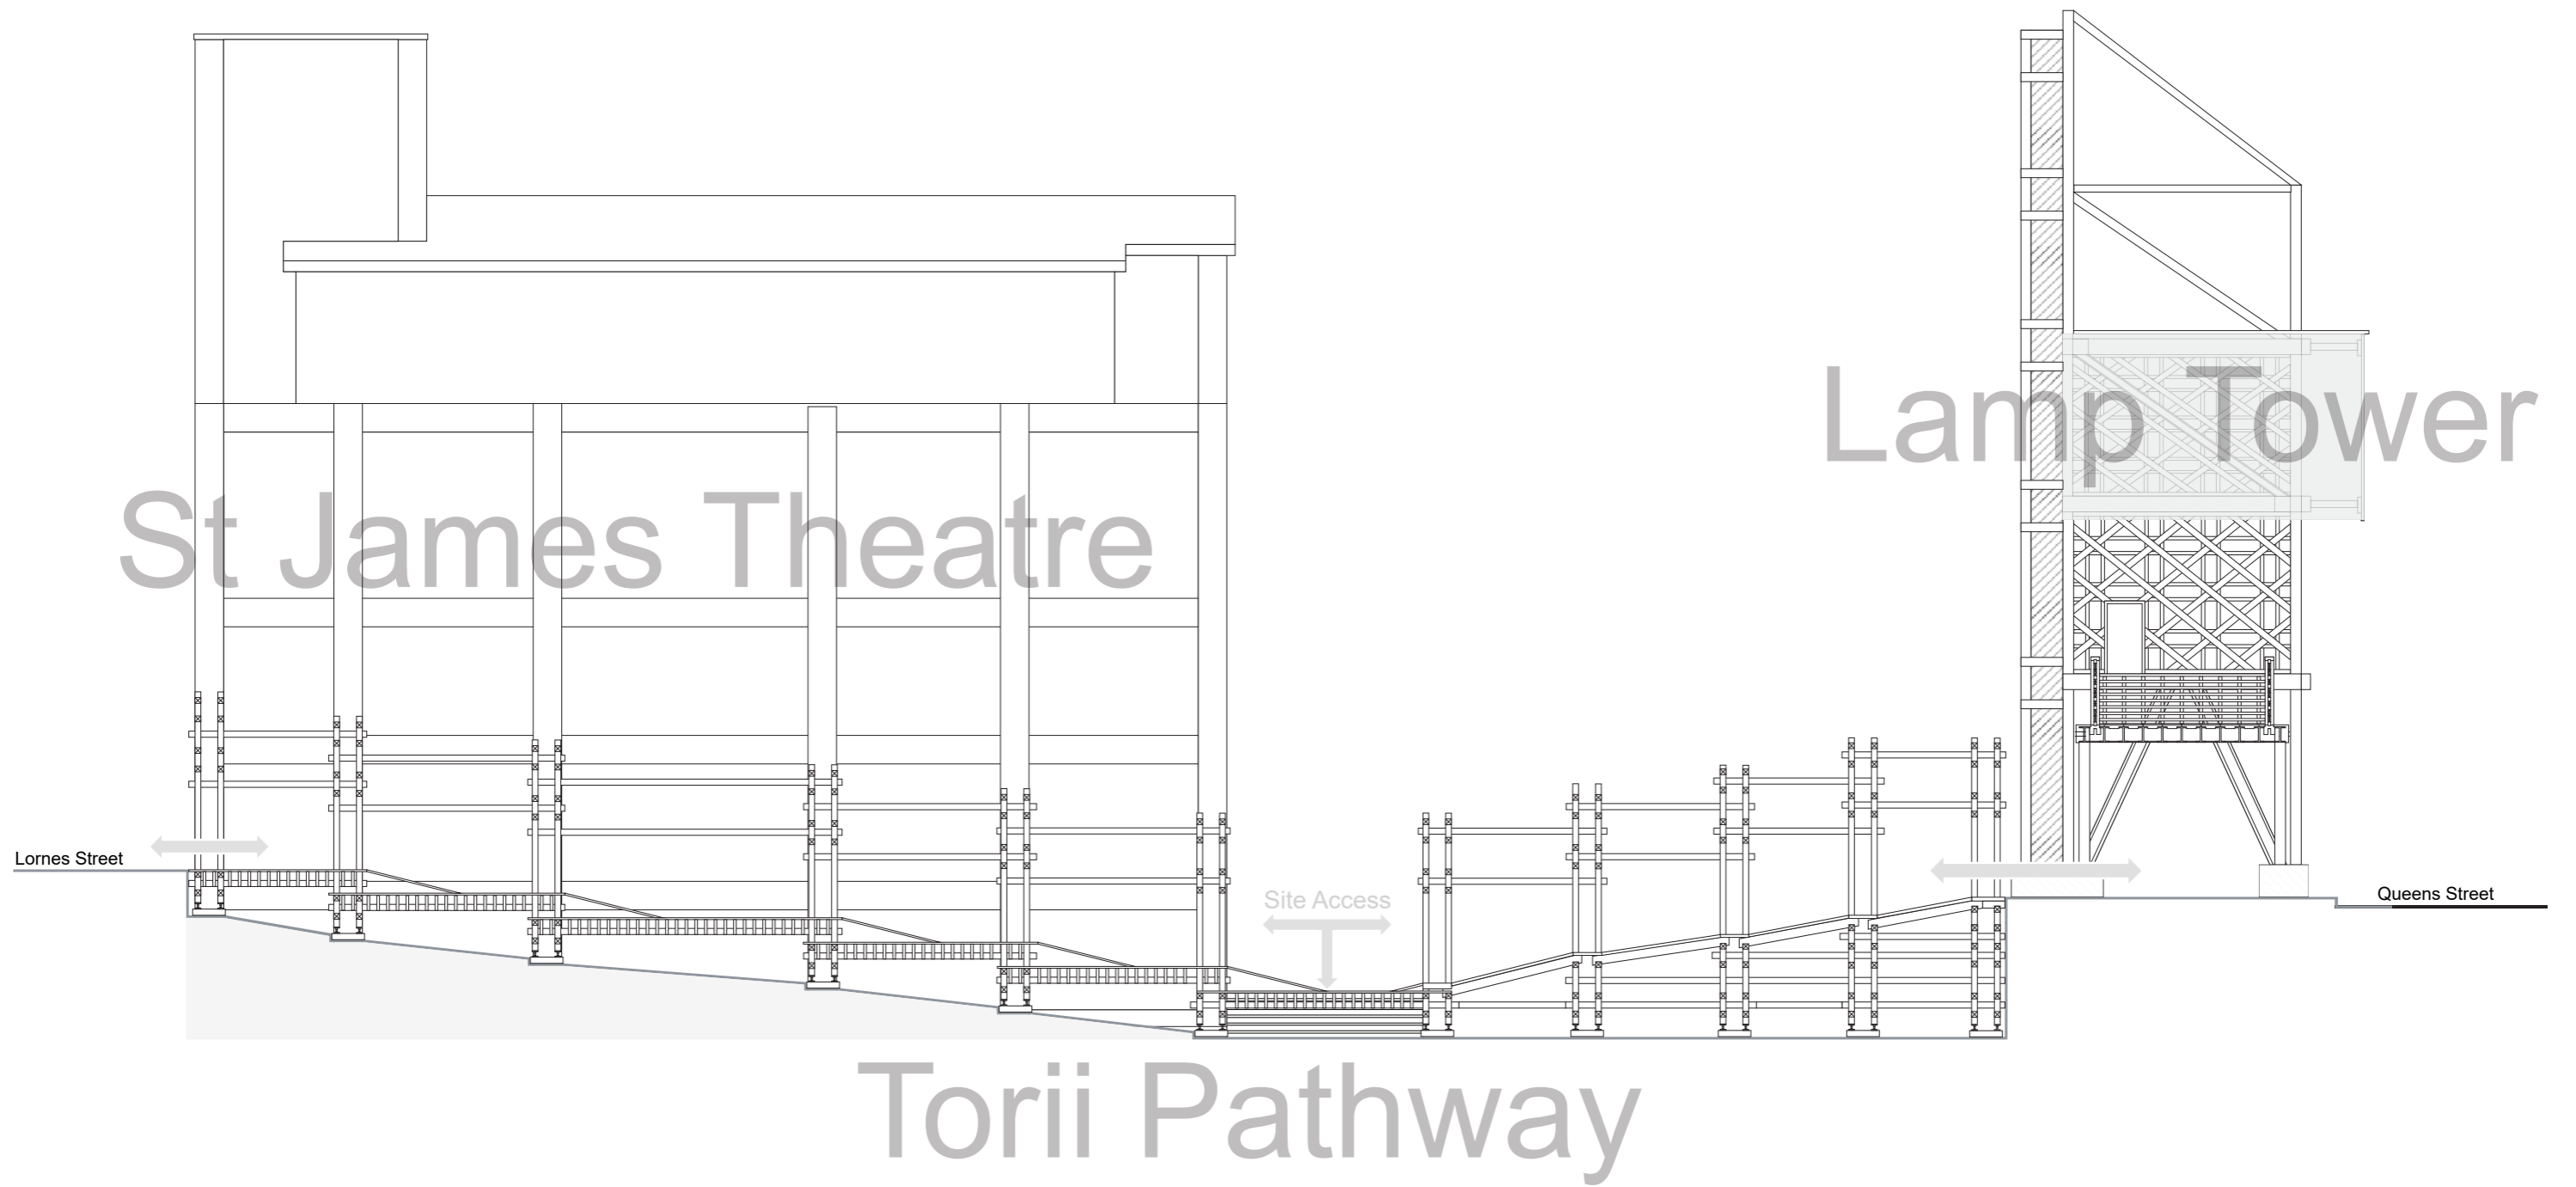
1:50 Detail Section image, showing the Torii Pathway and Lamp Tower in Project Site. 2025
